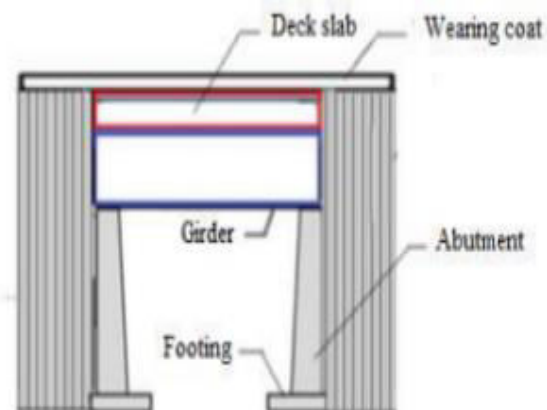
Longitudinal section of Solid Deck Slab Bridge.
